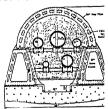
Multiple Pipe Lines Using Filler Type Insulation.
